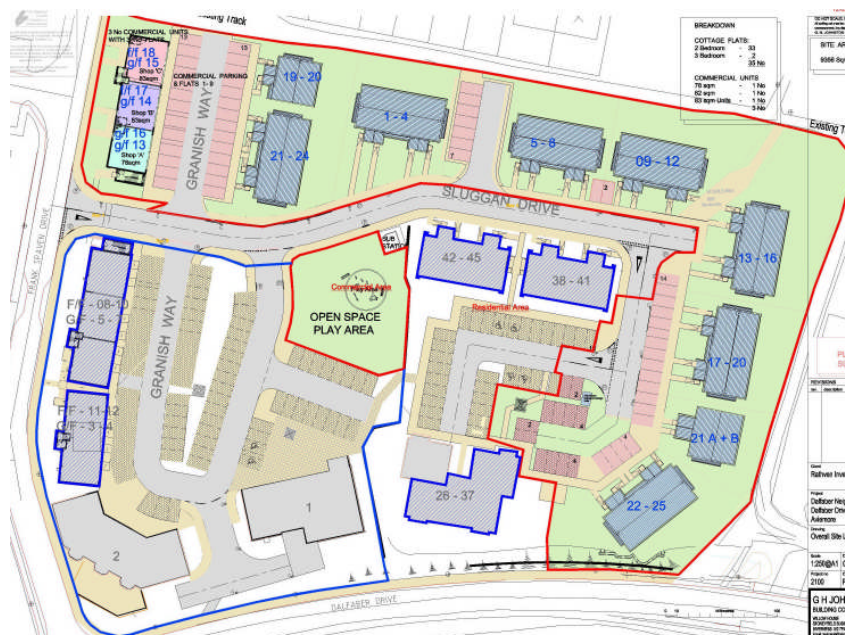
Proposed site plan, including new open space / play area in a central position
